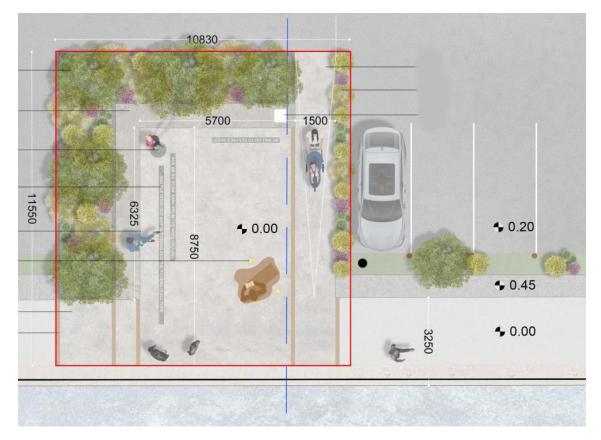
Proposed Layout of Shantyman Sculpture Scheme
